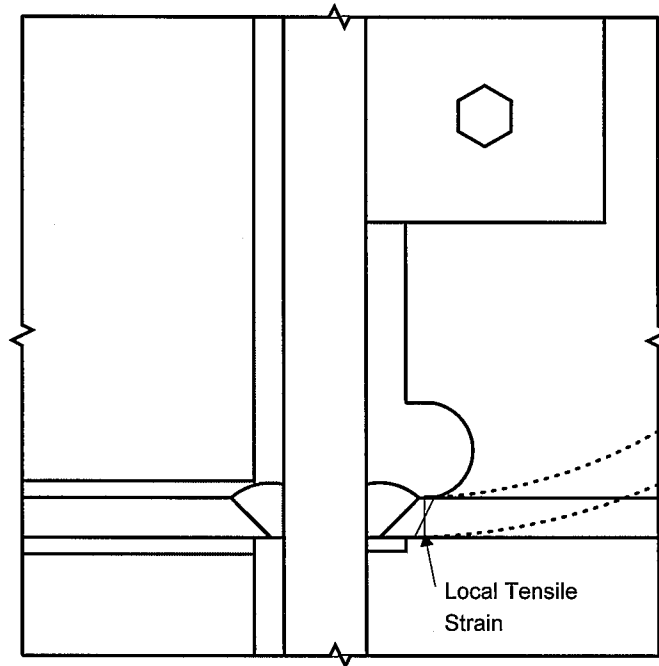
Elevation IV: Girder Flange Localized Bending Condition (Positive Girder Bending)
